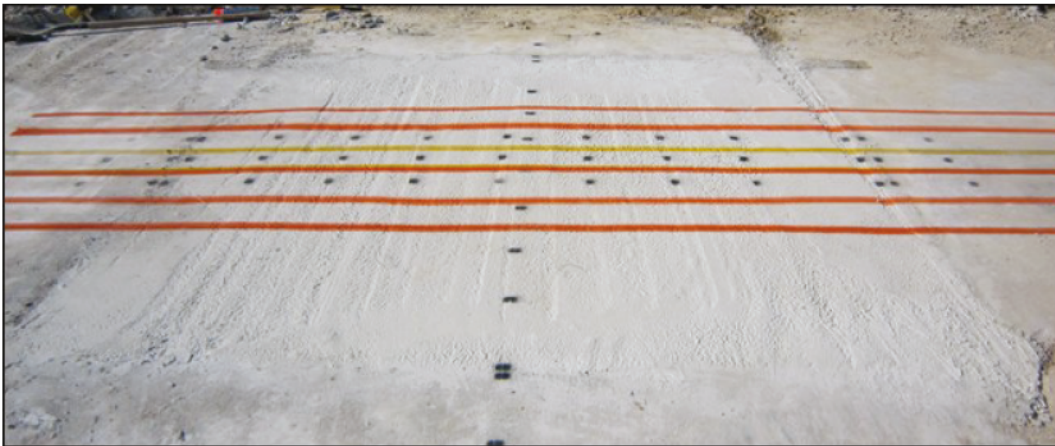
Finished rapid-setting concrete cap on Repair 2.
